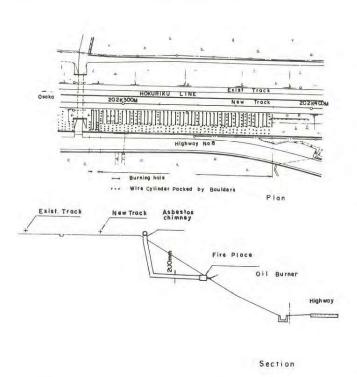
Thermal stabilization of the new embankment near Kanazawa
